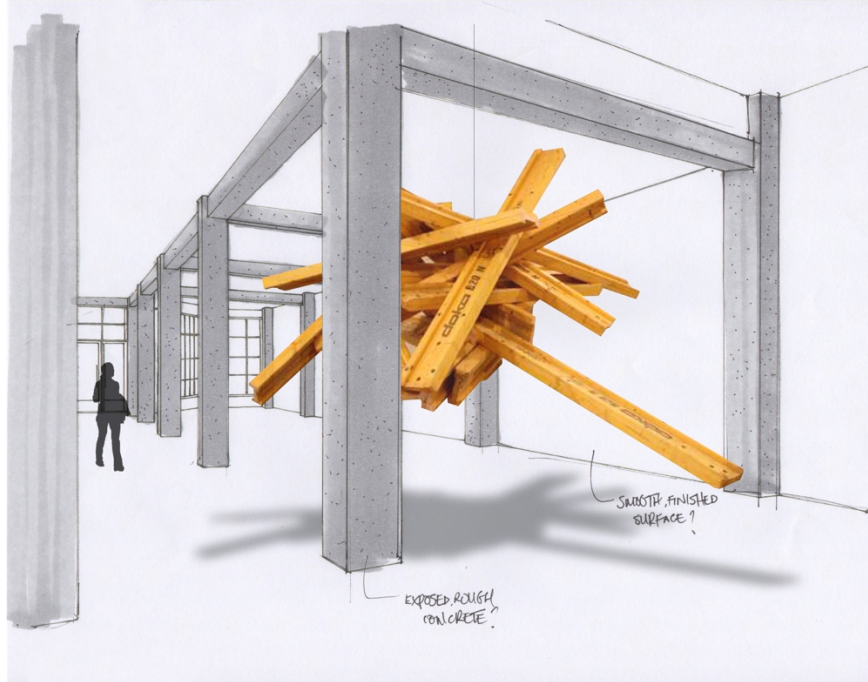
Conceptual sketch of gallery space looking towards the entrance. Smooth drywall finishing contrasts with rough concrete columns and beams.
